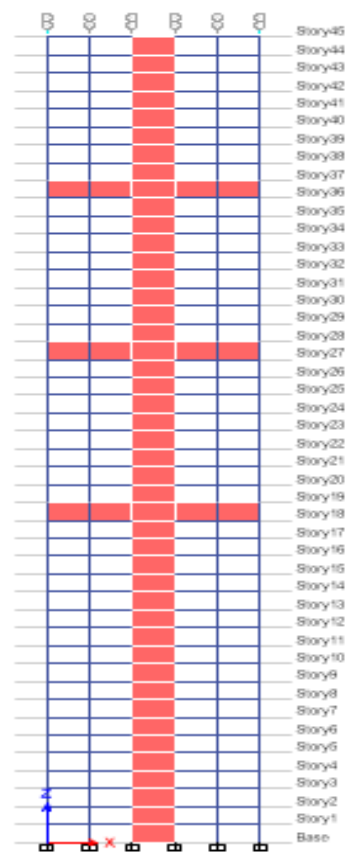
Structural model with 3 outrigger and belt truss system (SM 3)
